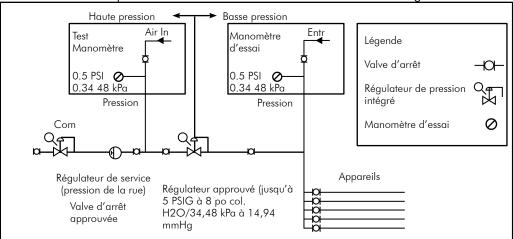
Pressure Test Requirement for Elevated Pressure Systems
